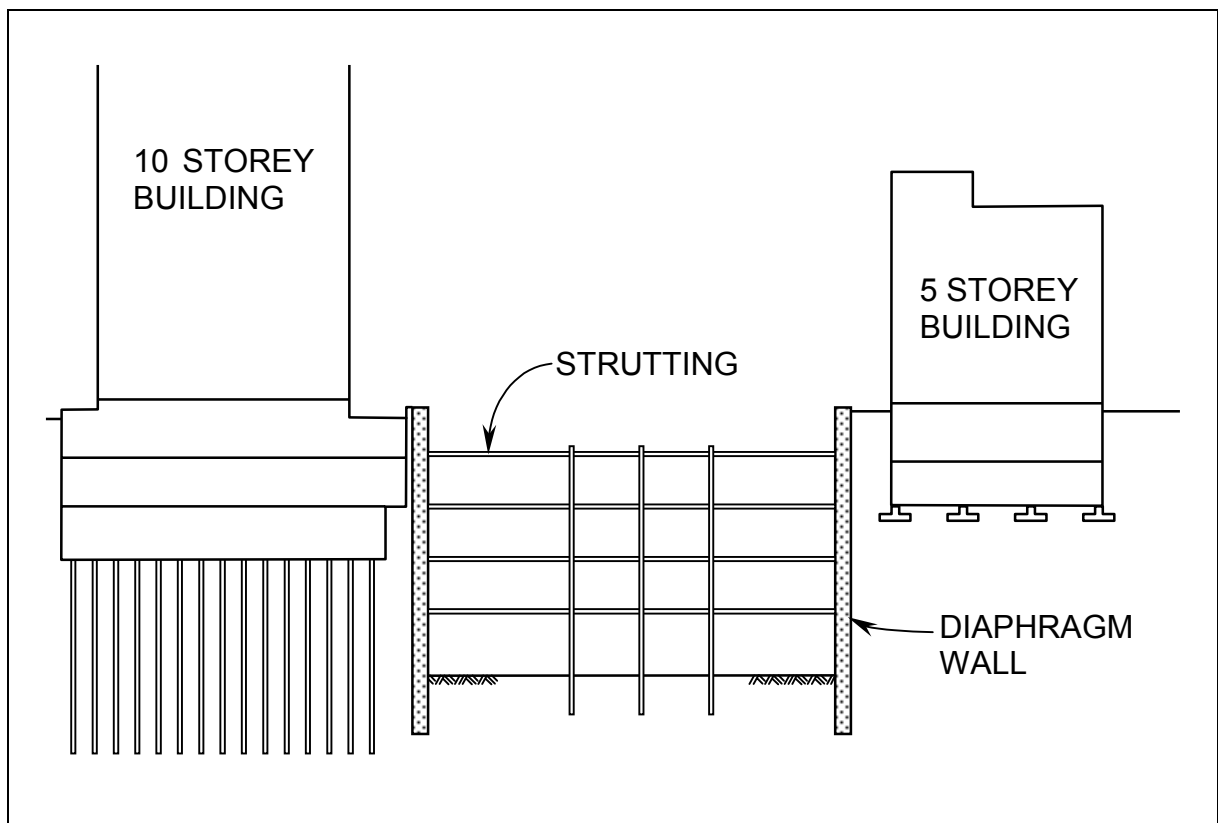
Section Through Diaphragm Wall in Seoul, South Korea 1989
